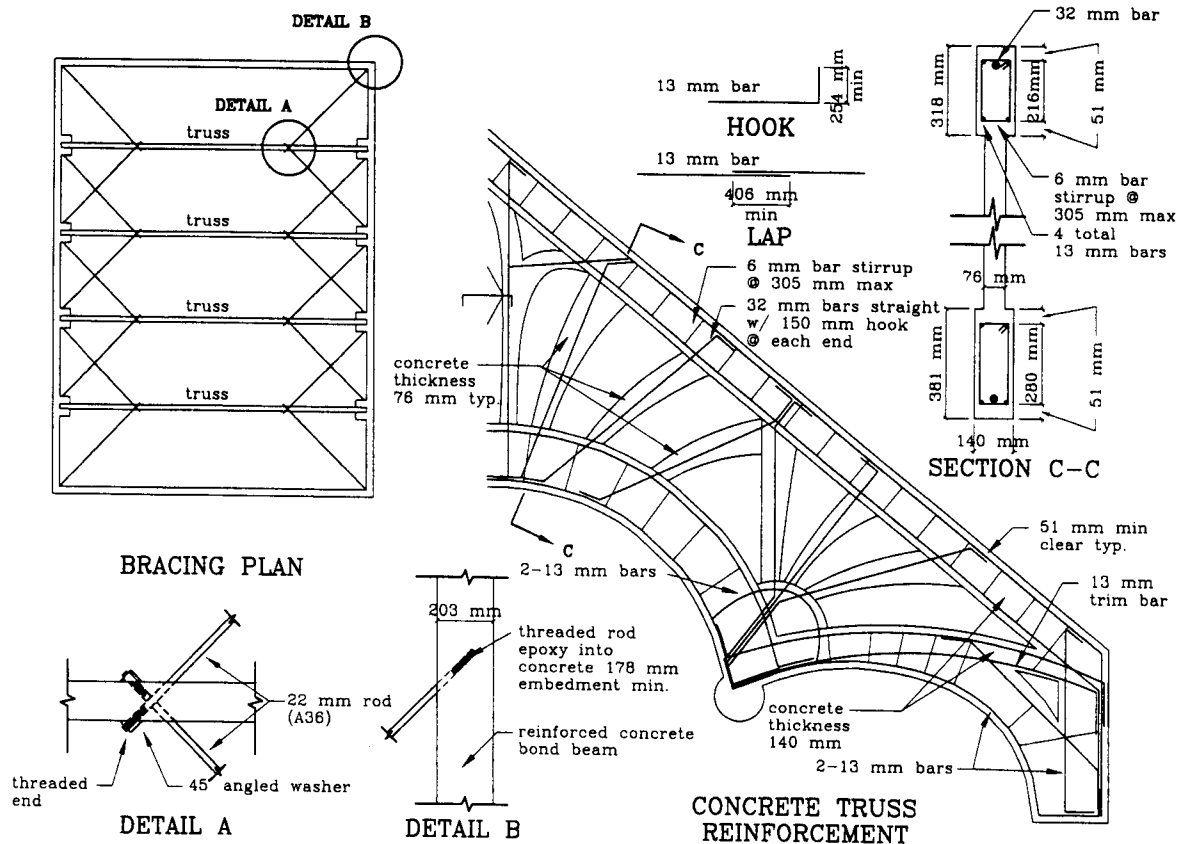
Principal Reinforcement for Truss and Details of Bracing Scheme Used to Reduce Out-of-Plane Bending Caused by Seismic Excitation
